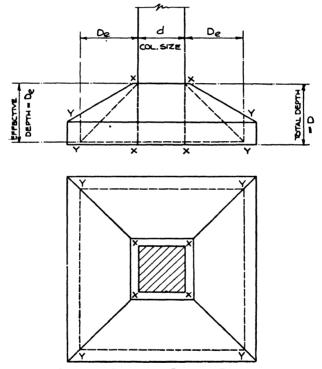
SHEAR ON COLUMN FOOTINGS.
